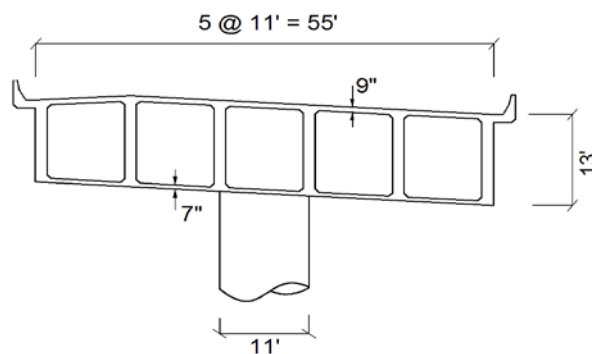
Cross-Section of Post-Tensioned Box-Girder Bridge
